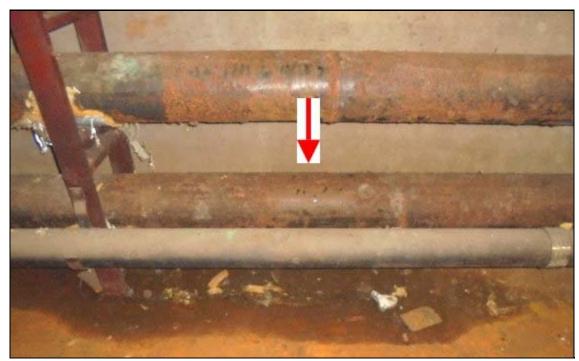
Photo File #: phl-1-72.jpg Detail: Pipe Location / Condition Orientation: Above Side View
